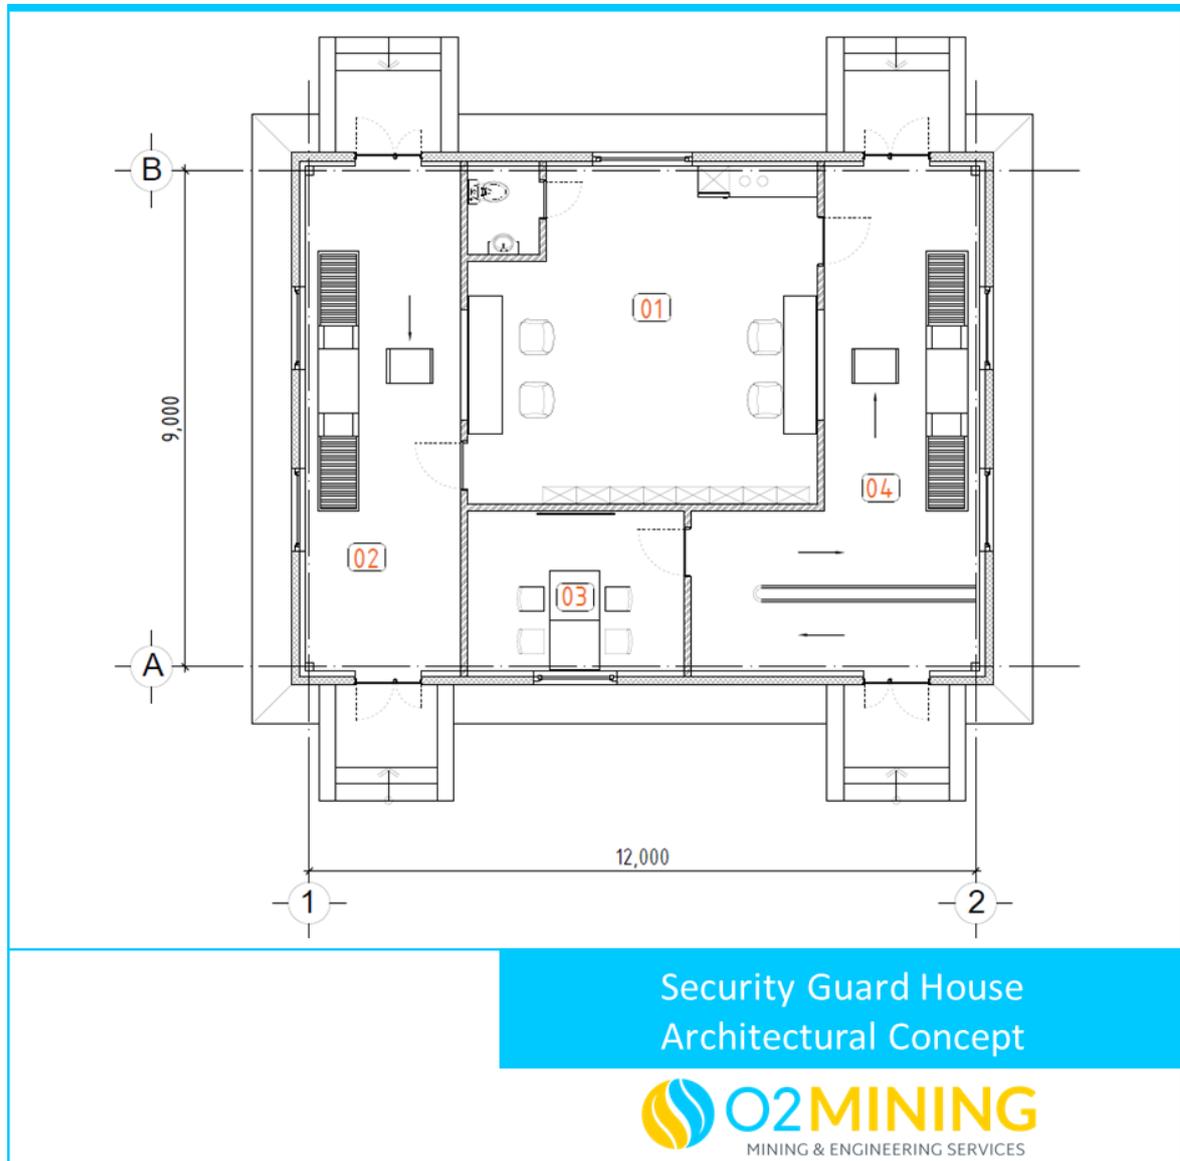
Security Guard House Architectural Concept (Source O2 2023)
